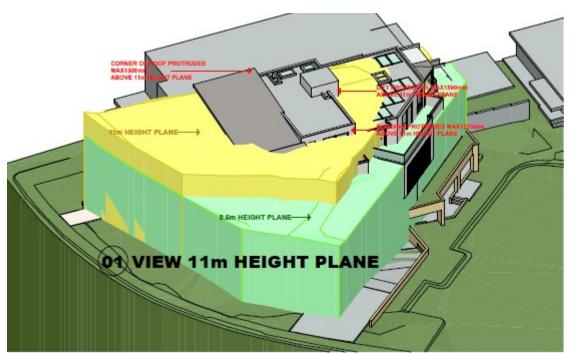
(above): Proposed building height diagram with breaching elements shown in grey (noting that neighbouring buildings are also shown)
